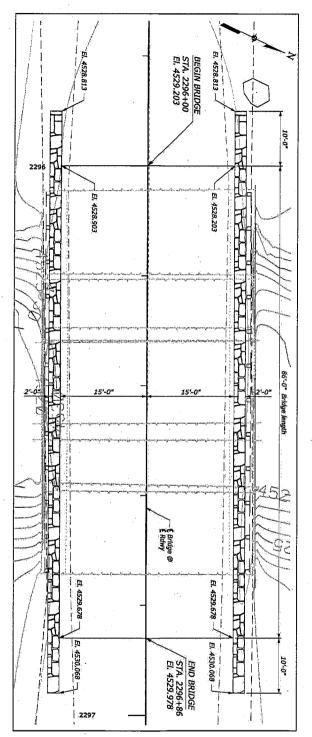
Preliminary design layout for the new Rose Creek Bridge; grade diagram.
